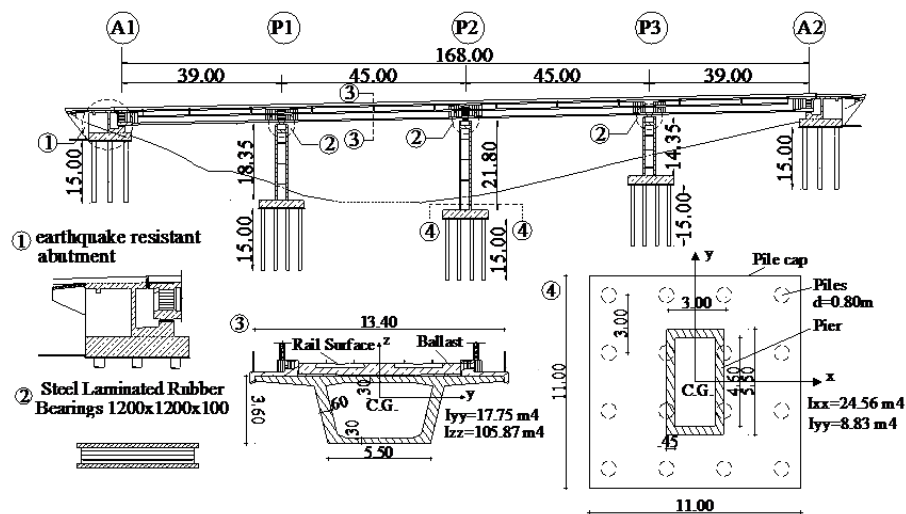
Section details along the bridge span: (1) Bridge abutment; (2) steel laminated rubber bearings; (3) deck cross-section; (4) plan view of the pier and its foundation
